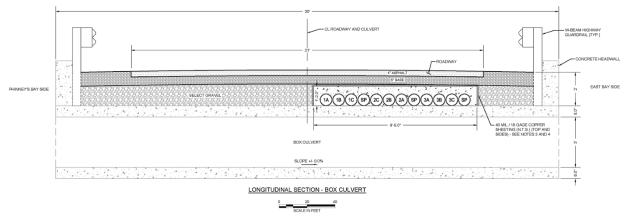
Cross Section for the Phinney's Bay Box Culvert Crossing with the Proposed Underground 12W×1D Duct Bank and Conductive Copper Plates. SP= Spare Duct. As indicated in the drawing, a 40MIL (0.040-inch) copper shield consisting of three copper plates installed over the top and sides of the concrete duct bank is proposed for minimizing the magnetic fields associated with this shallow duct bank. The proposed conductor phasing arrangements for the three circuits are also indicated in the drawing.
